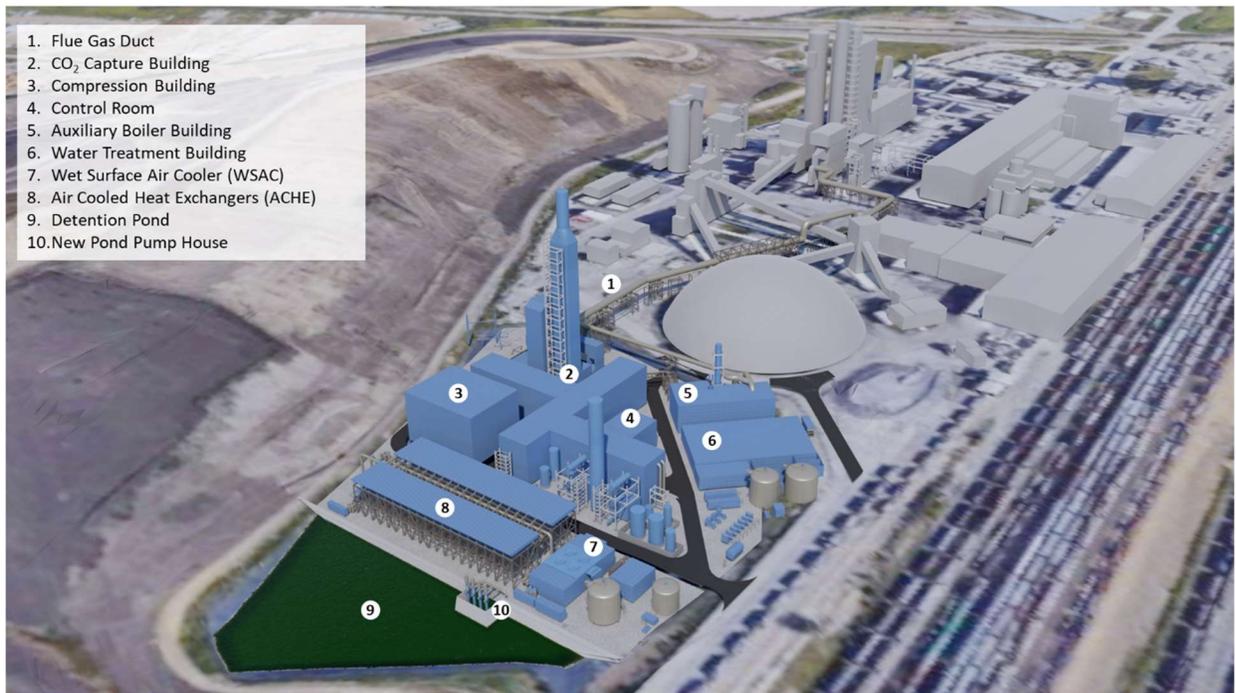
SITE LAYOUT FOR POND OPTION
